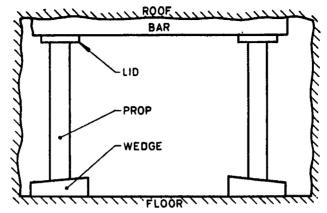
Two Props Supporting a Bar in A Heading or a Roadway
